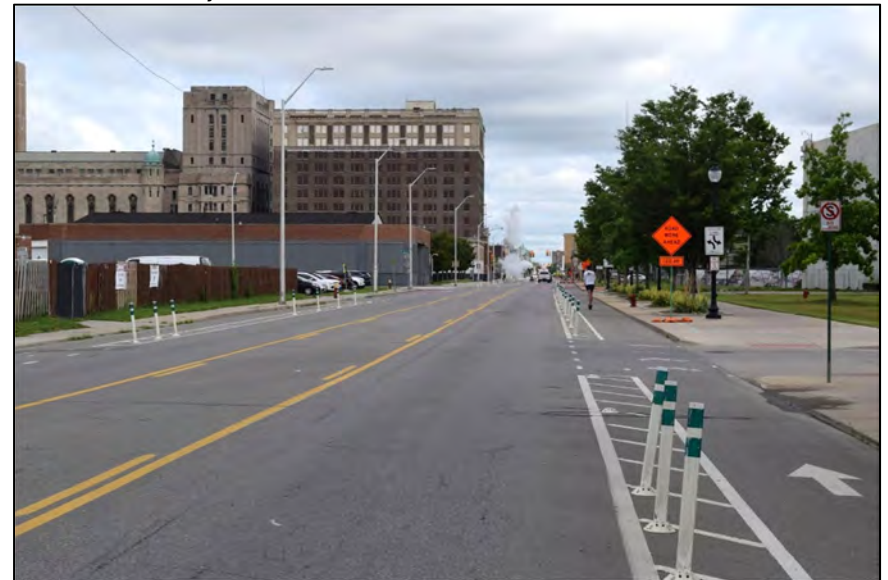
View north on Cass Avenue from vicinity of rear of 210 Henry Street. Project site on left.
